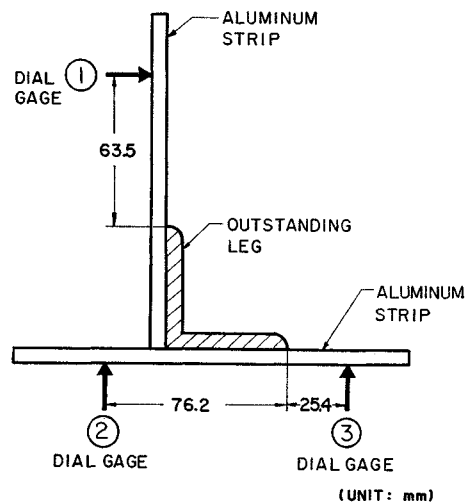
Locations of the Deflection Gauges at Colum Center (UNIT: mm)
